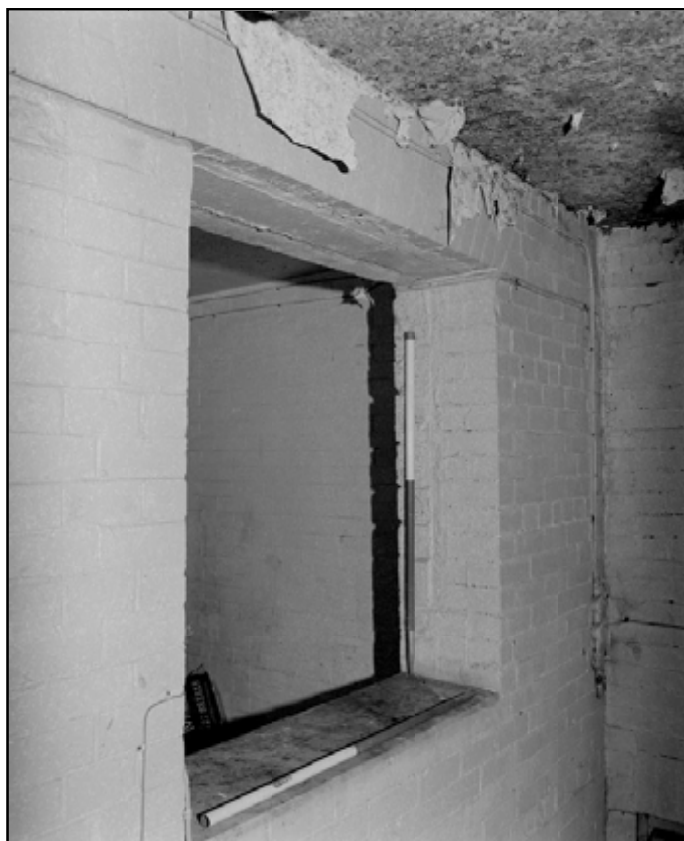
General view of window in east wall of room 2; note rubbed brick arch above from original larger window (film 8.02)
